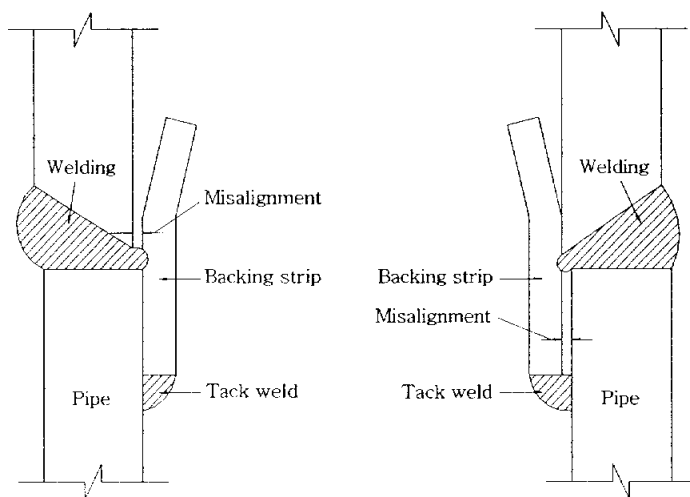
Misalignment at Field Welded Joint in Pipe Structure
